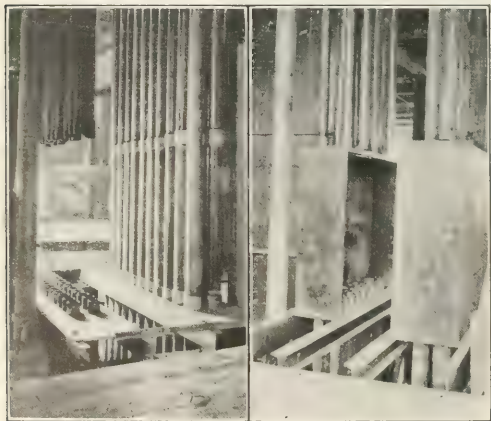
MAIN BANKING ROOM, FIRST FLOOR
